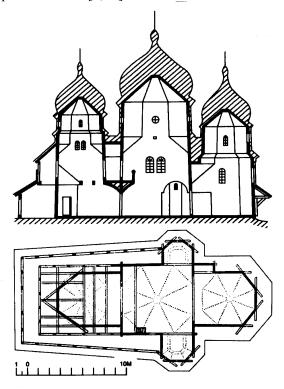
St. George's Church in Drohobych: 1 longitudinal section and plan (available at: [10])
